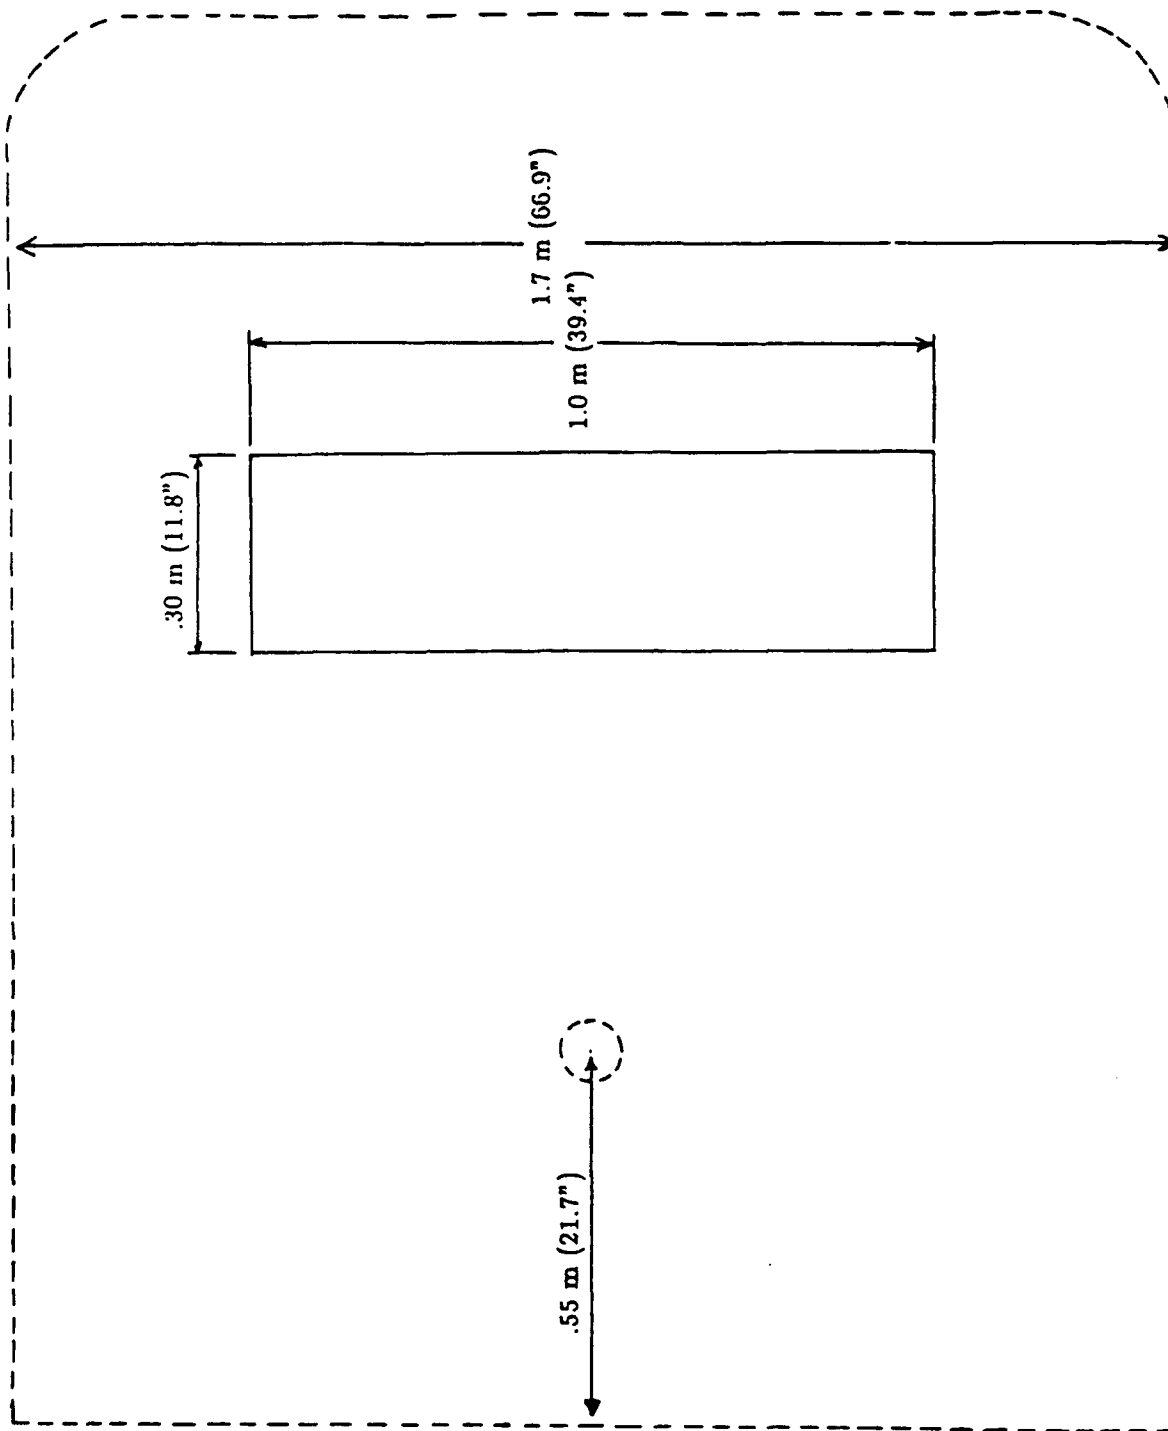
1/10th Replica-Scale Tested (Plan View).
